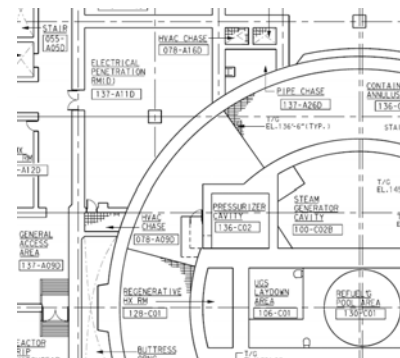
Drawing for room 137-A11D (Electrical penetration room) in auxiliary building
